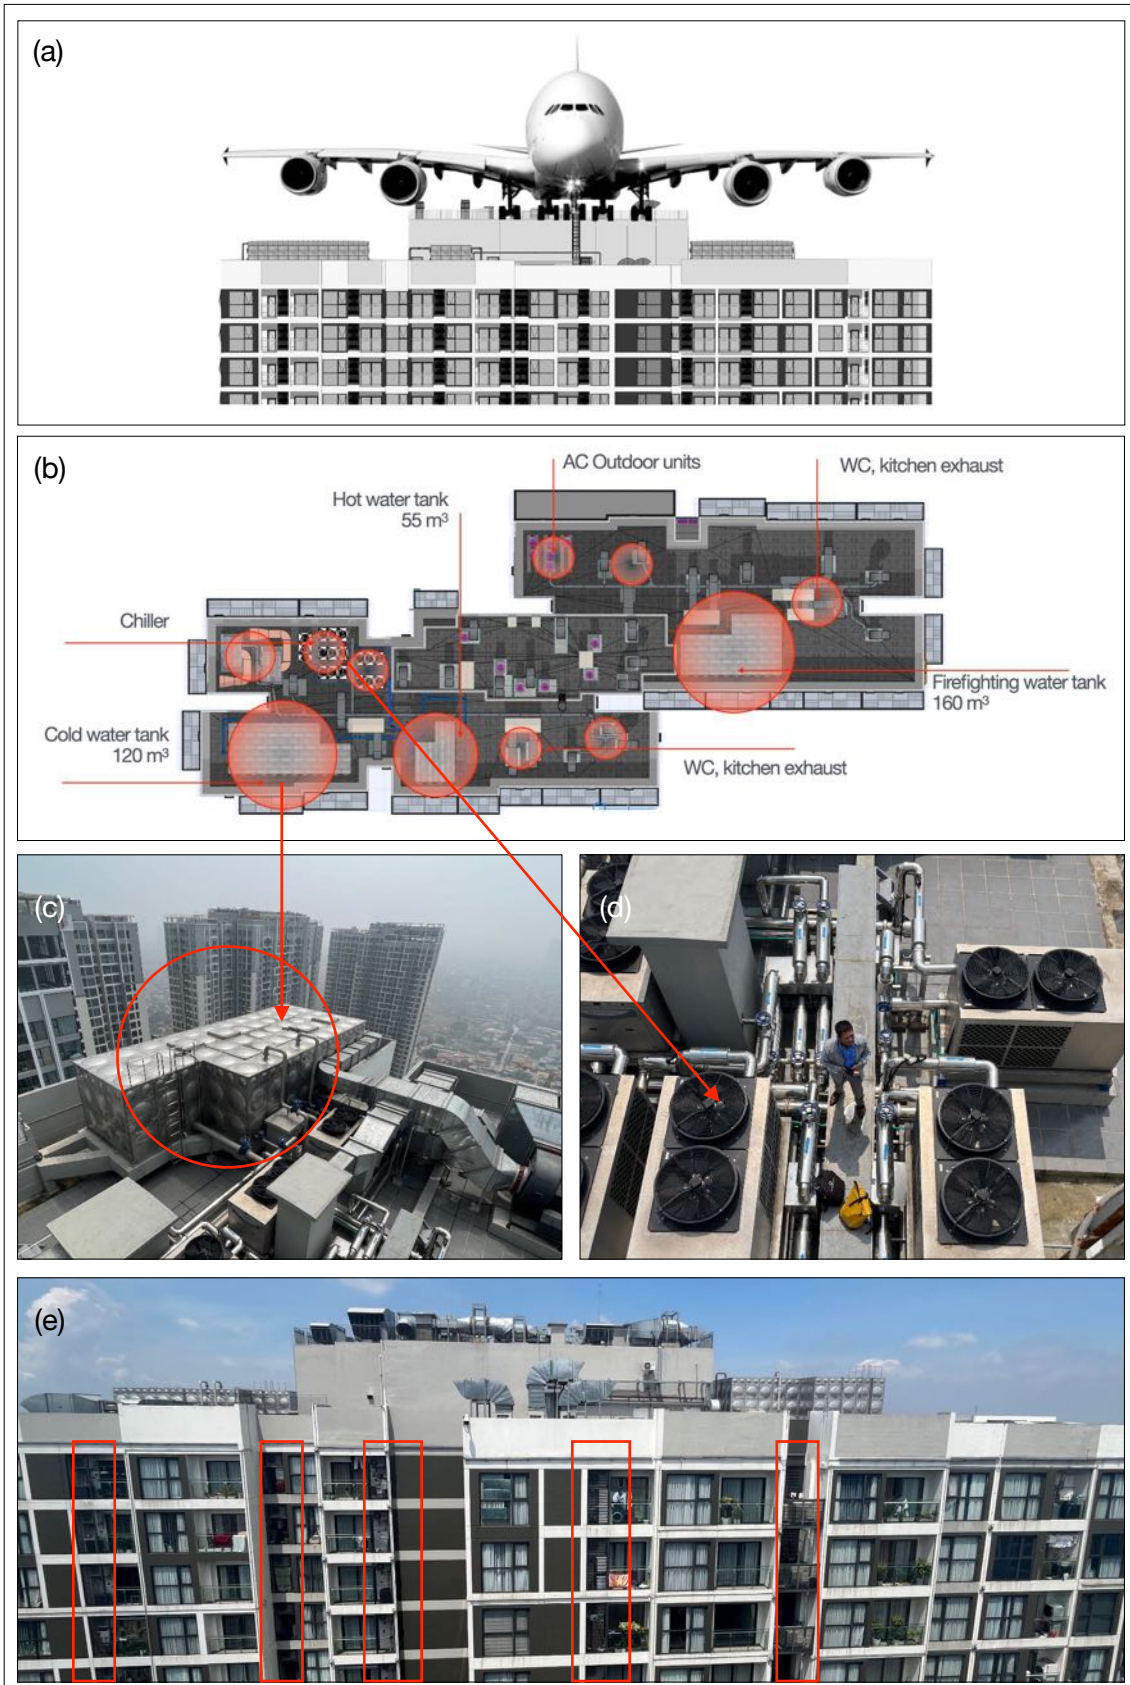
(a) Load Comparison A380 on T2, (b) As-built Technical Equipment Arrangement, (c) Cold Water Tank, (e) Chillers, (e) Areas for Wall mounted AC Outdoor Unit/Split
